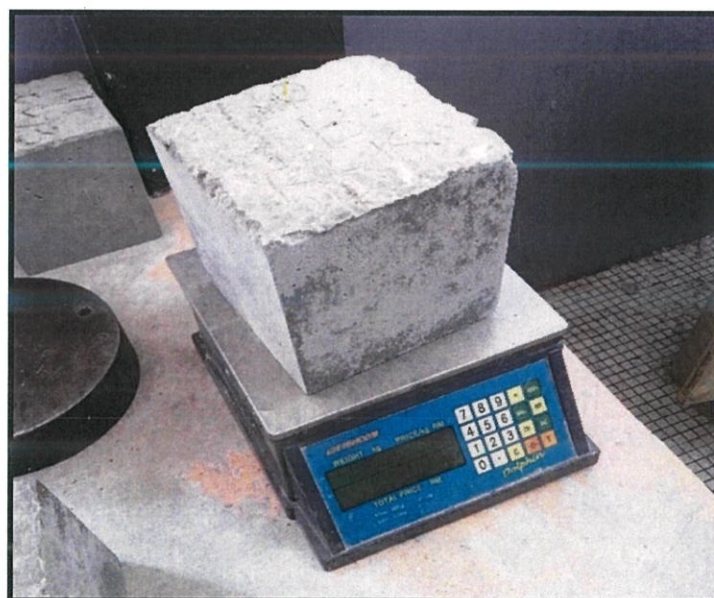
Shows concrete cube Grade 35 being weighed before undergoing the cube test
